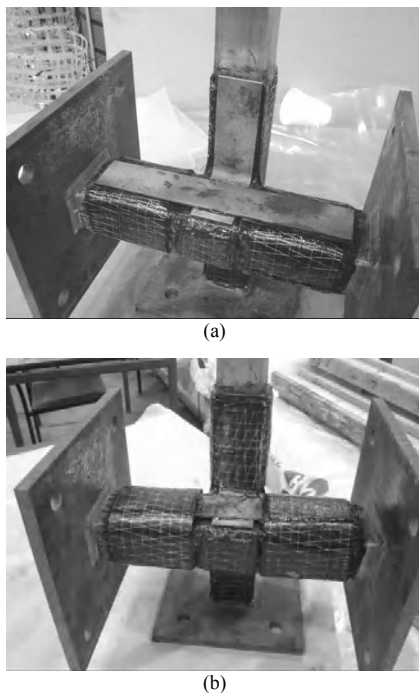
Strengthening cracked S1R1L1A with CFRP sheets and steel plates (a) attaching an L-plate and a holding plate; (b) finished specimen
